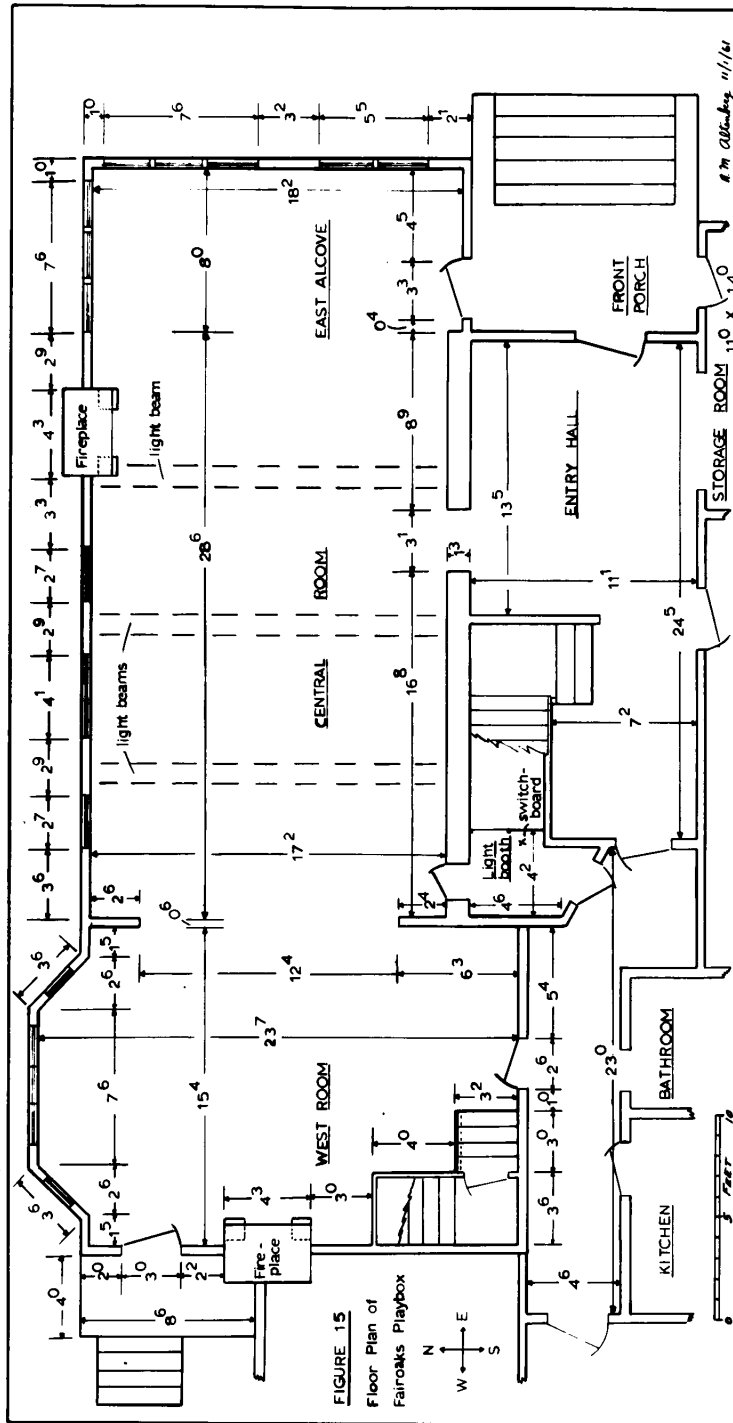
Floor plan of the Fair Oaks Playbox.
